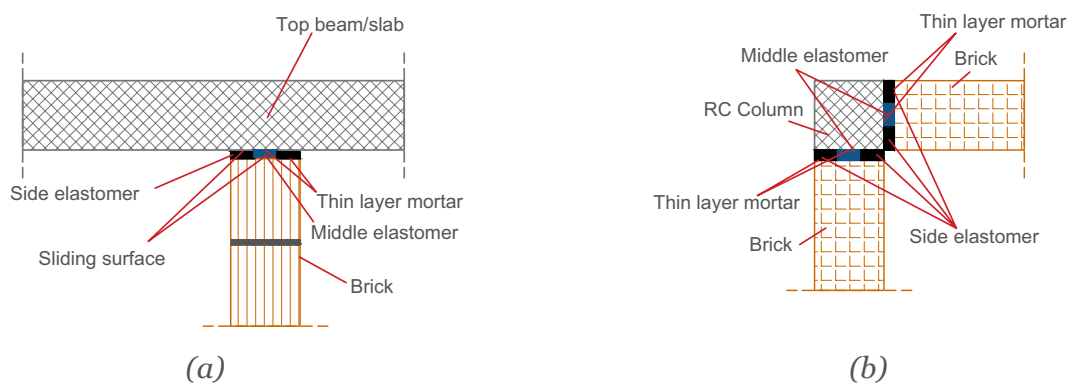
Type 2 joint system. (a) Wall to beam/foundation connection. (b) Wall to column connection.
